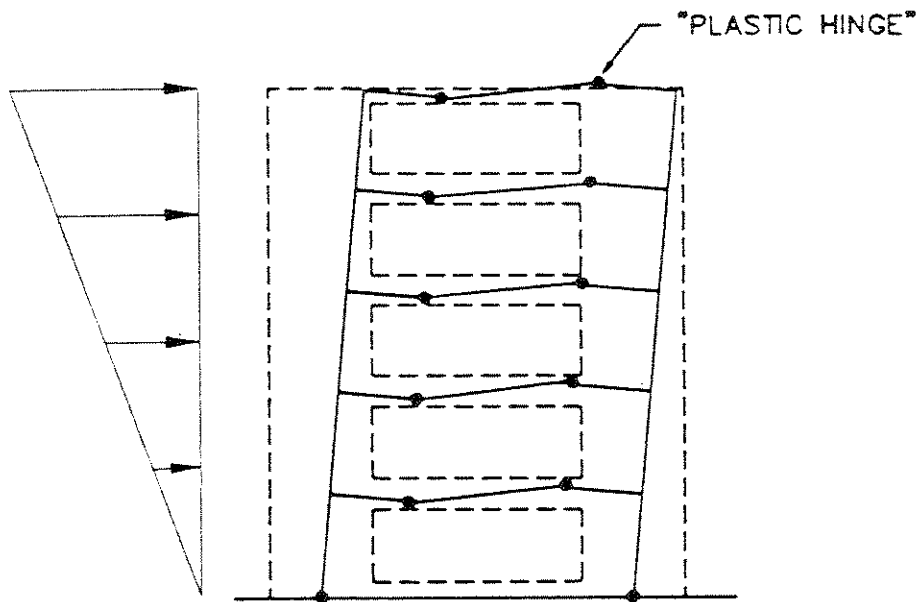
Base Wall and Coupling Beam Yielding Mechanism
